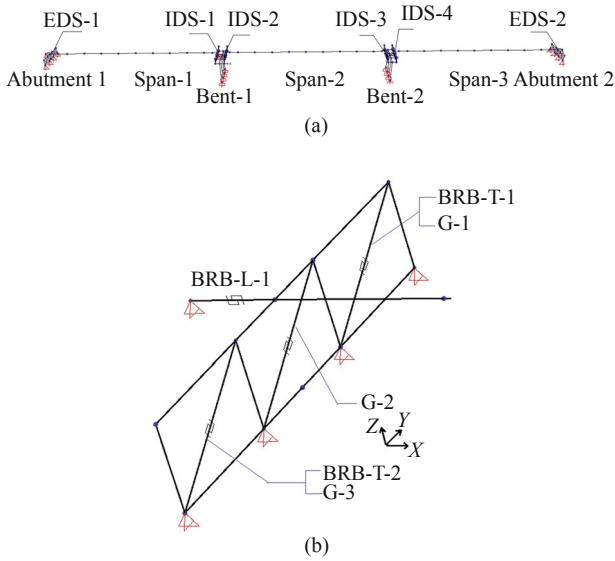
(a) SAP2000 model of the multi-span bridge (b) enlarged view of the EDS-1 on top of Abutment-1
